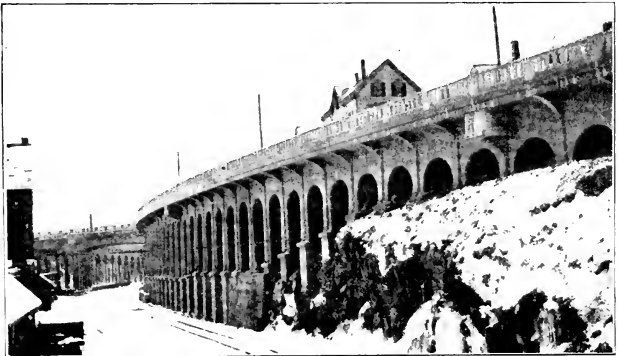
SECTION 6, LOOKING TOWARDS SECTION 4.
